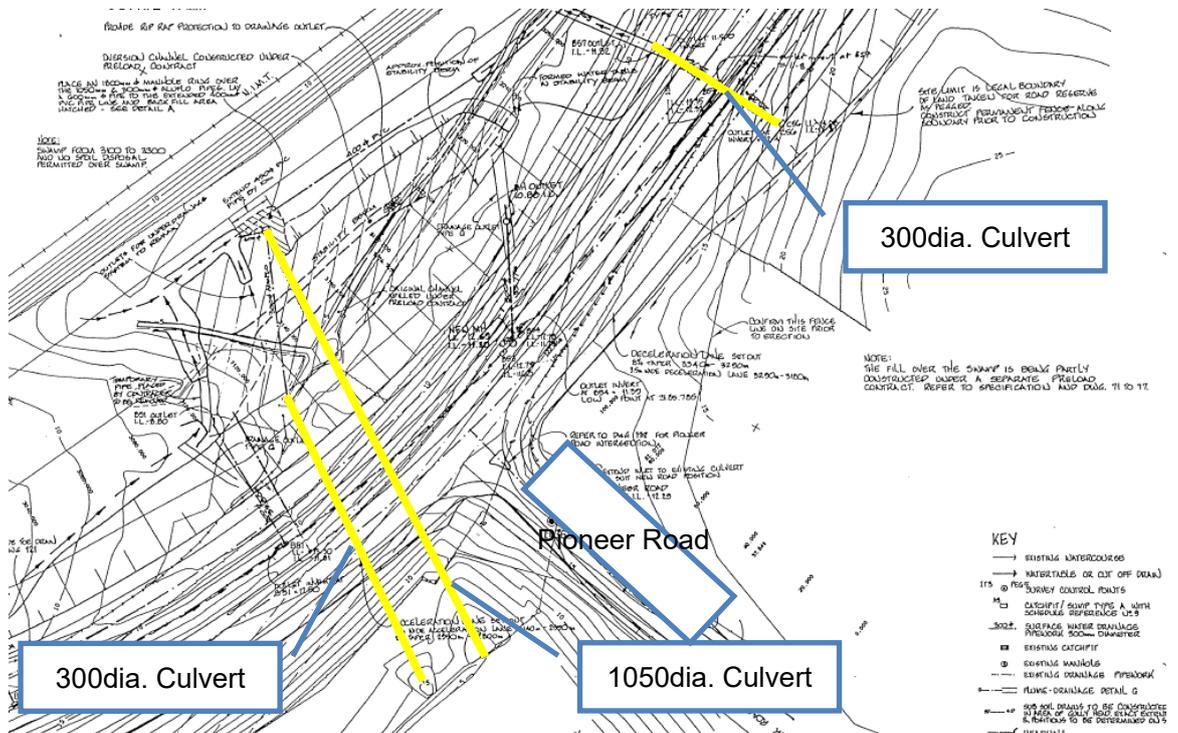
Pioneer Road – External Catchment SH1 Stormwater Culverts (62 Bluff Road). Source: Waka Kotahi As built records.
